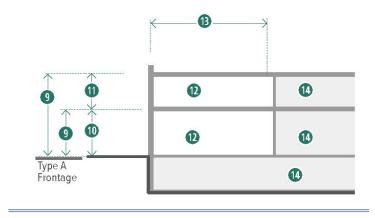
Commercial Storefront Building Section: Height & Use Requirements
